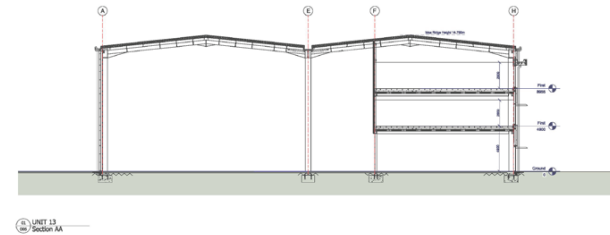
UNIT 13 GA SECTION - NOT TO SCALE
